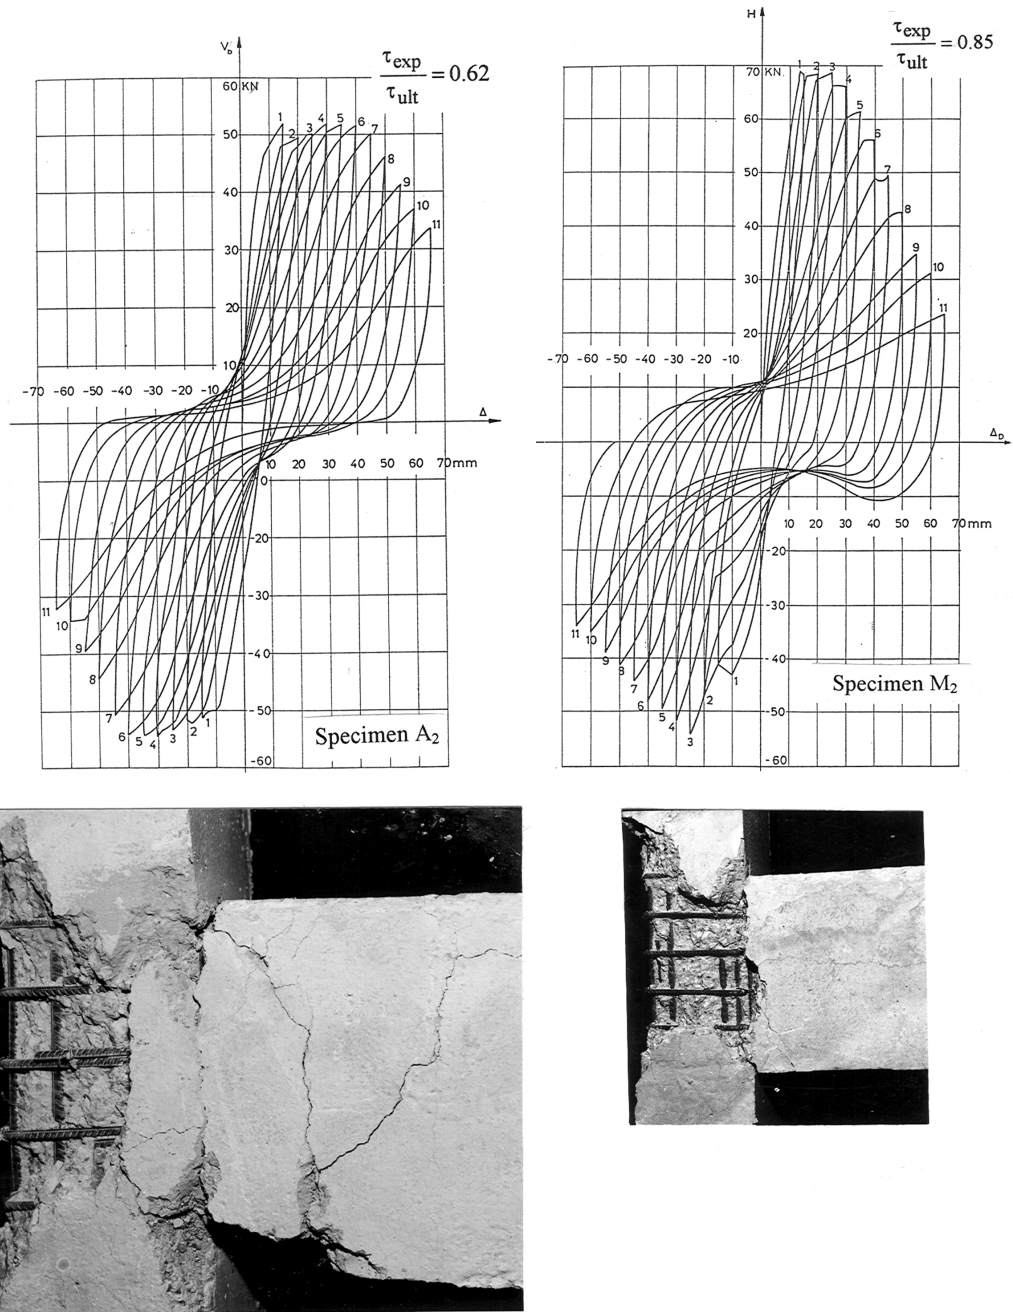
Hysteresis loops and cracking pattern for specimens A₂ and M₂
